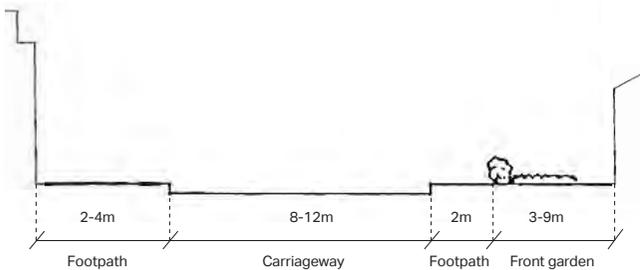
Section showing the A259 with varying carriageway and footpath widths along the road.
